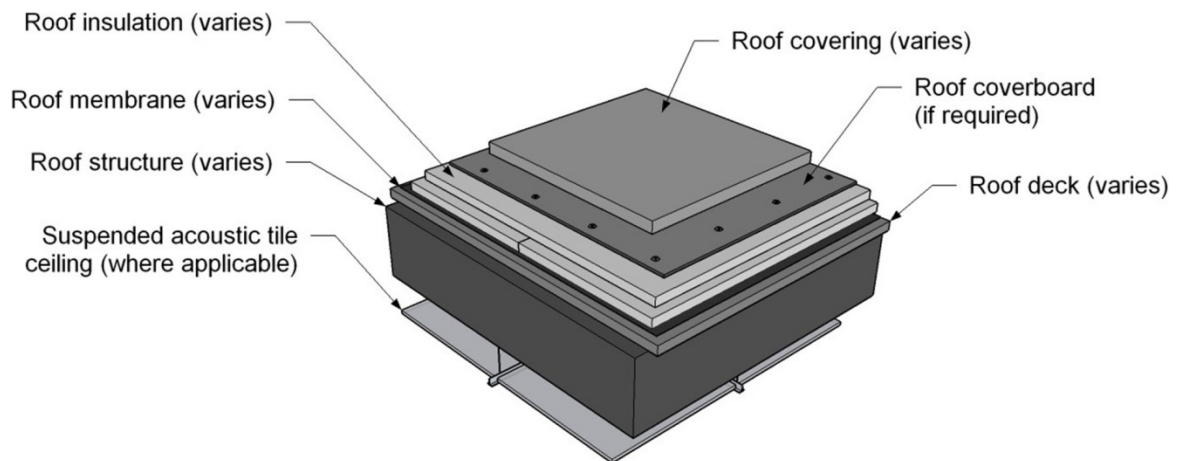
Typical Assembly Layers for Roof Enclosures
